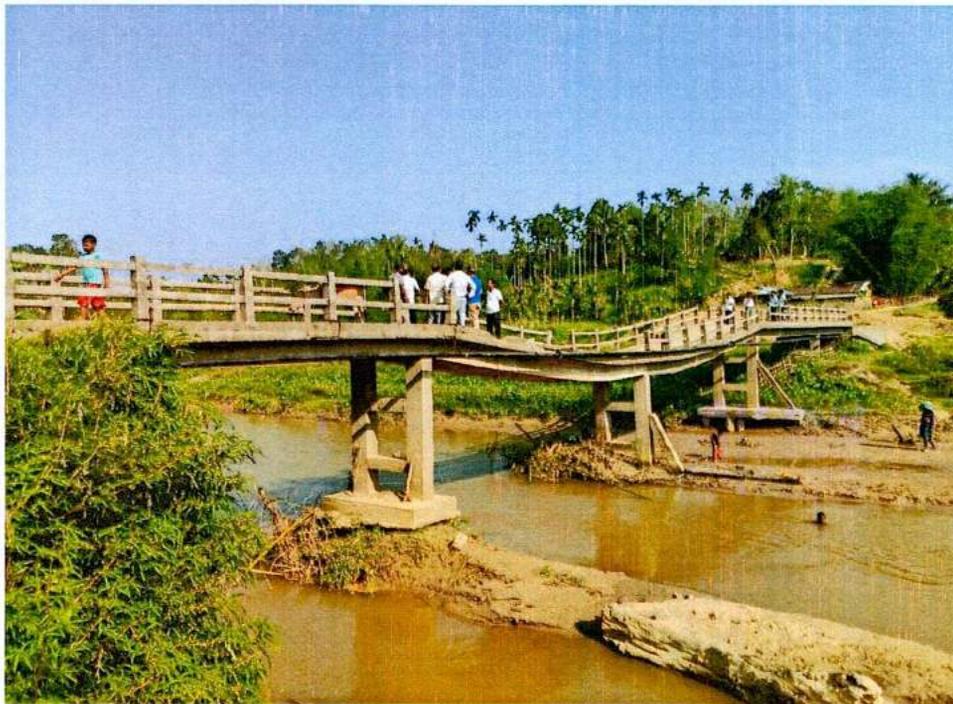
The small paved bridge connecting Chuta Nunai Village over the Lalacherra Nala.
